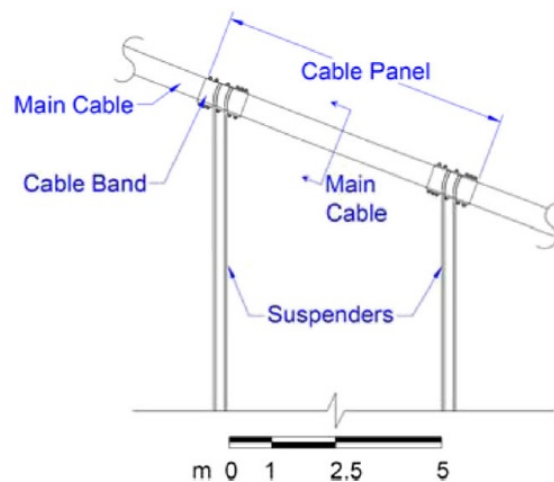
Schematic elevation view of a suspension bridge with major structural elements highlighted.
